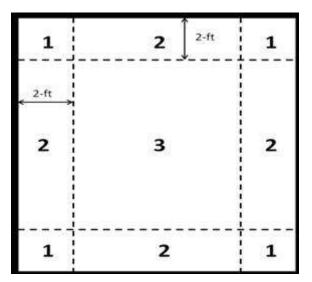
Typical slab layout showing the three locations (1: corner, 2: joint, and 3: interior).
